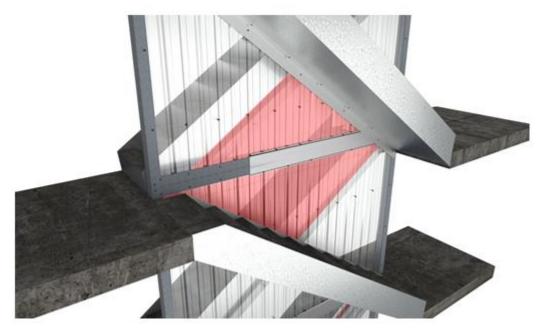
The section of vertically oriented wall providing fire separation highlighted
